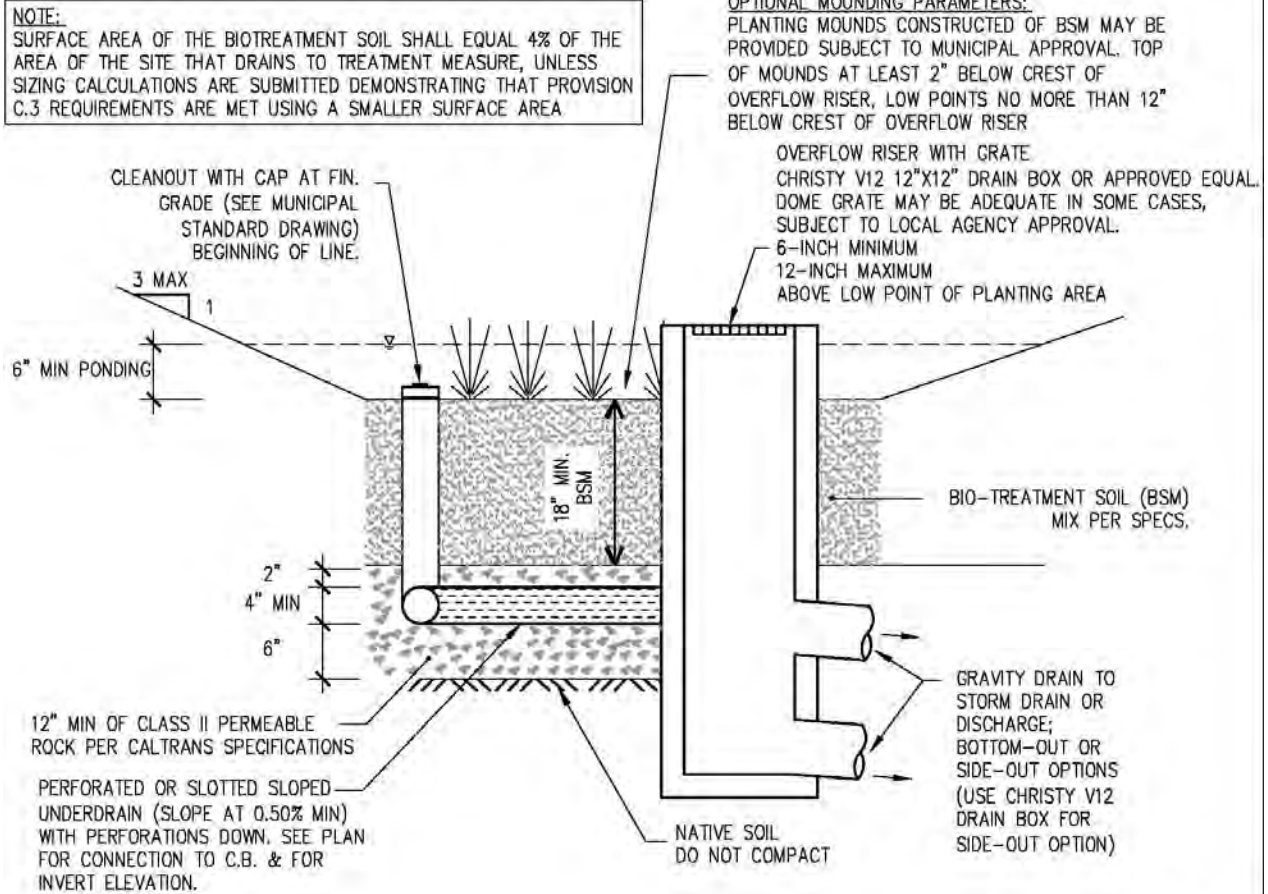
Cross Section, Bioretention Area (side view - Not to Scale)
